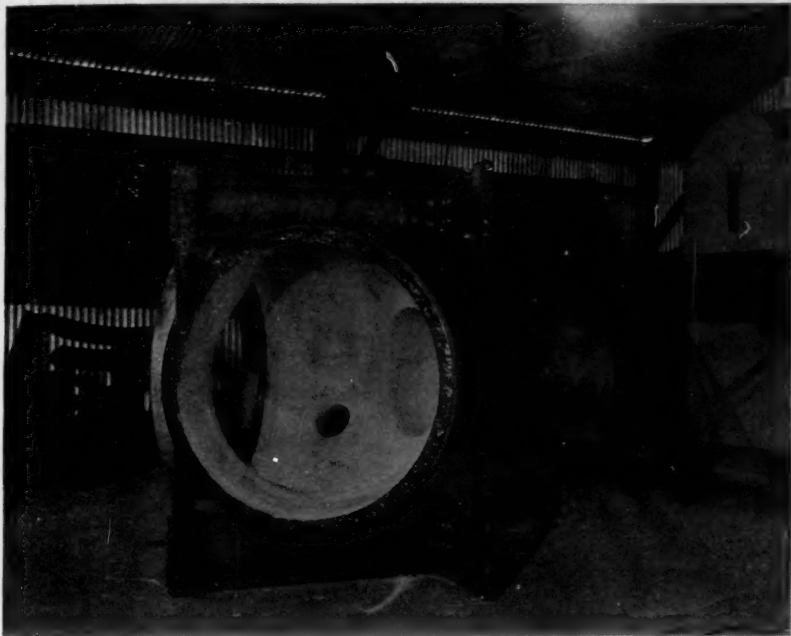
A "SPECIAL" FOR STEEL-CYLINDER CONCRETE PIPE
